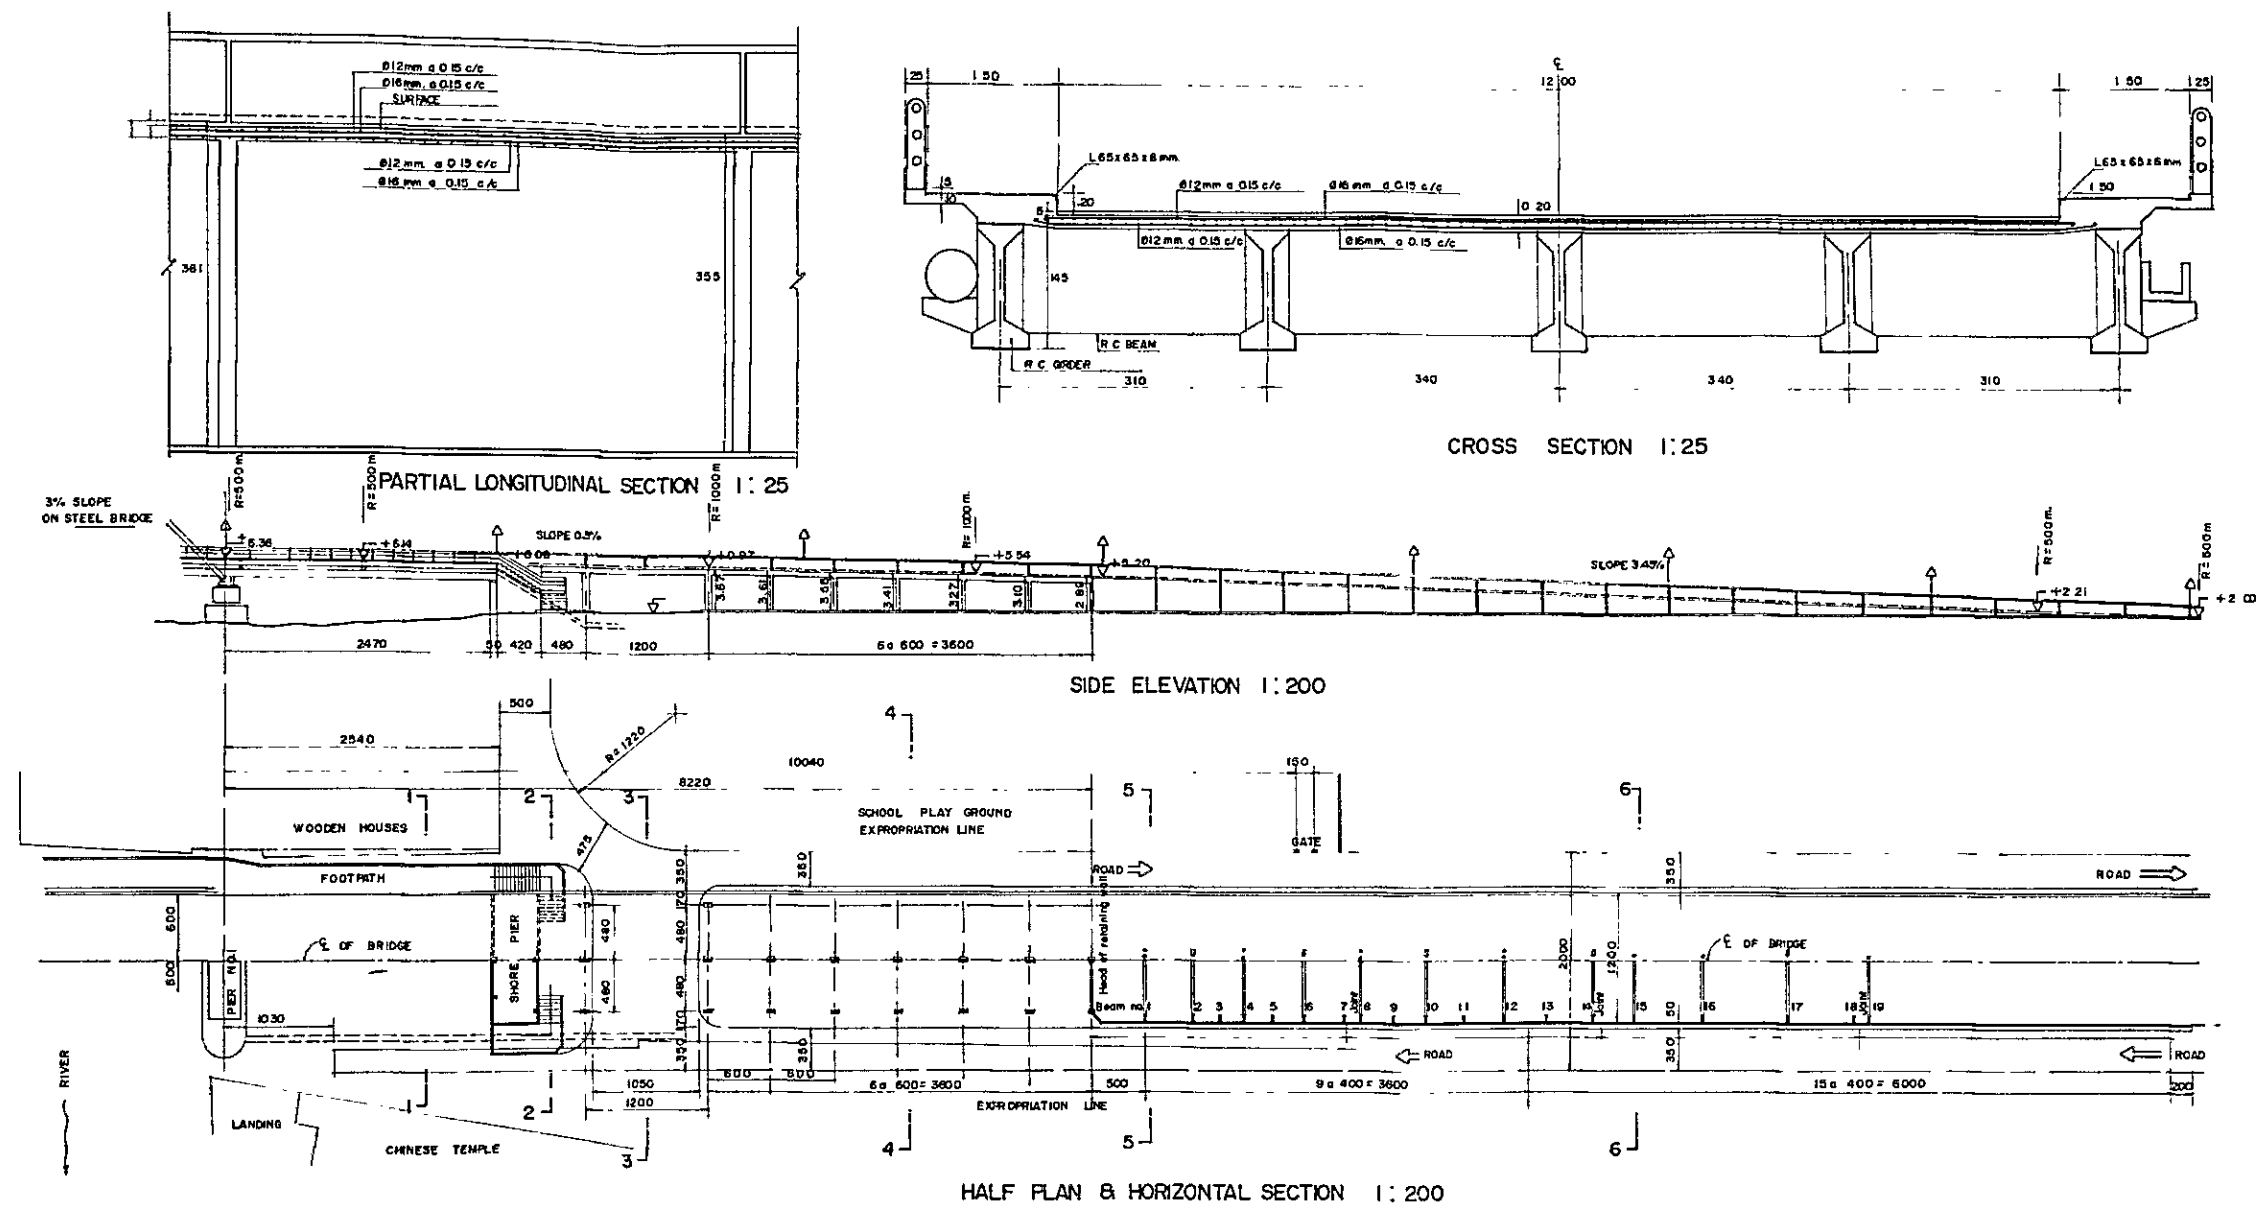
REPLACEMENT OF THE RC FLOOR SLAB ON THE RC COMPOSITE GIRDER
